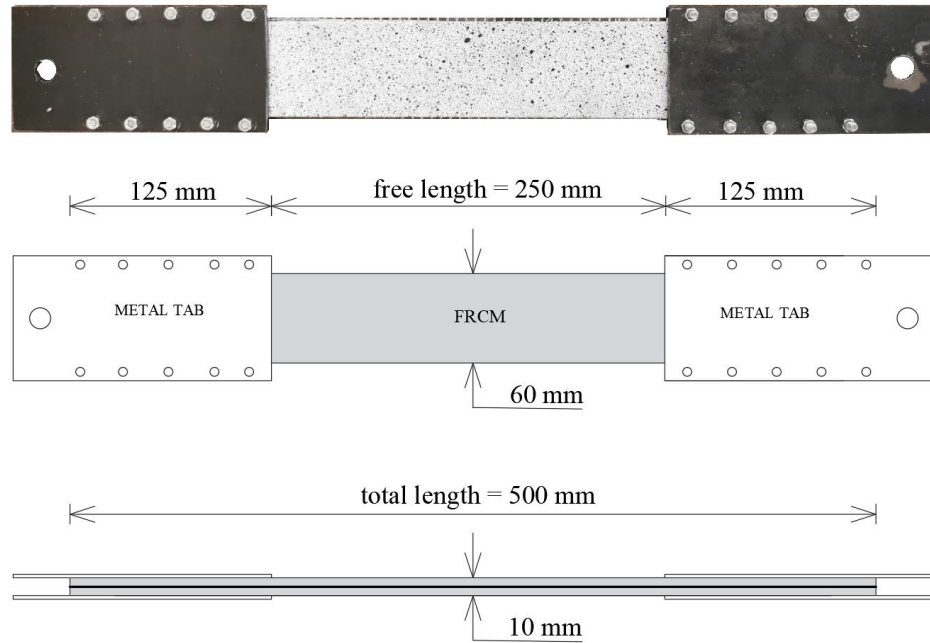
Geometry of FRCM sample equipped with aluminium tabs, for tensile tests with clamping grip method.
